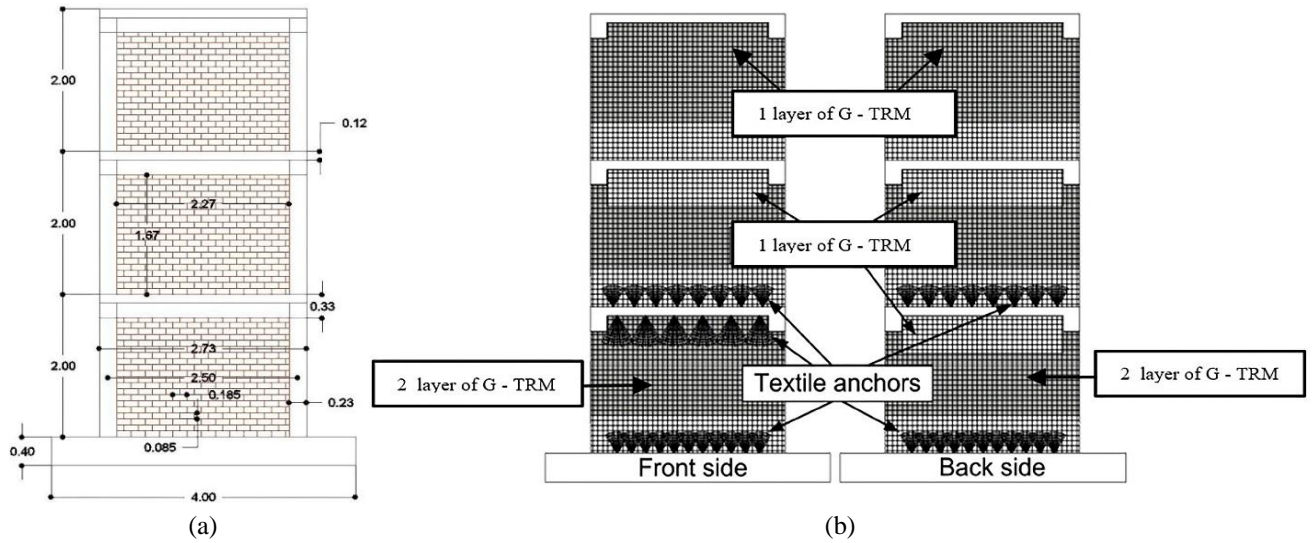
(a) Geometry of the masonry-infilled RC frame and (b) Strengthening scheme : textile anchors of first and second story and TRM layer on the faces of masonry infill at the first, second and third story[32].
